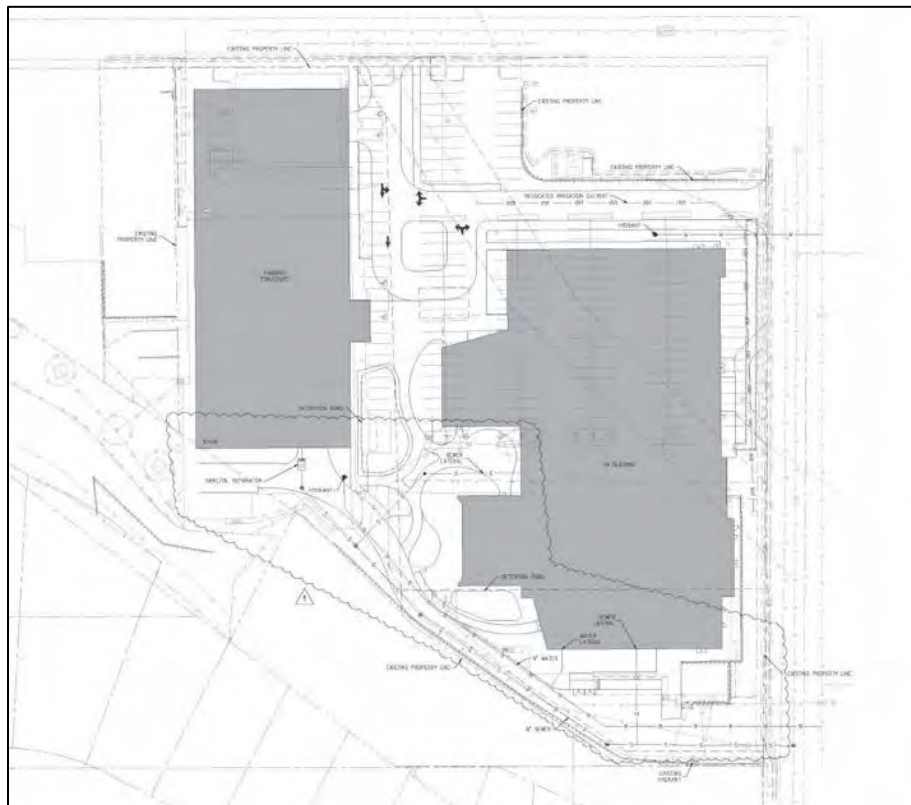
Site 2 Proposed OPC Concept Development Plan.
